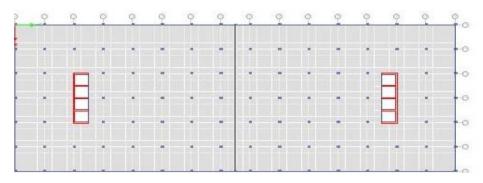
Typical floor plan of G+9 structure of 90m slab length with expansion joint.
